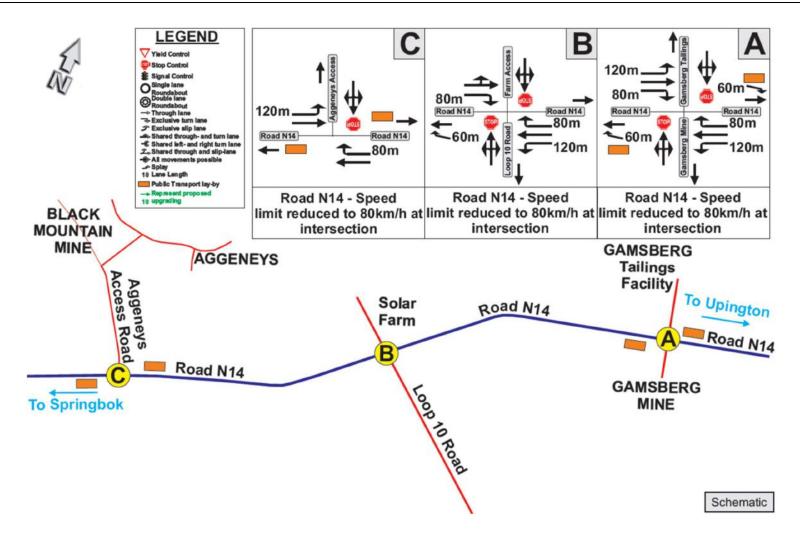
Graphical Presentation of the Recommended Intersection and Road Network Improvements as Part of the Existing Road Network and Not Relevant to the Implementation of the Proposed Gamsberg Smelter Project (Aggeneys Area)
